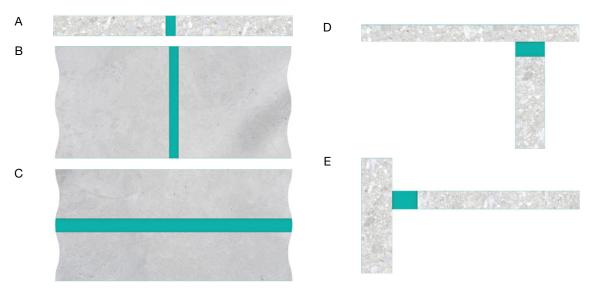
Possible linear joint applications between walls (A), in walls (B, C), between a wall abutting a ceiling (D) and a floor abutting a wall (E)
